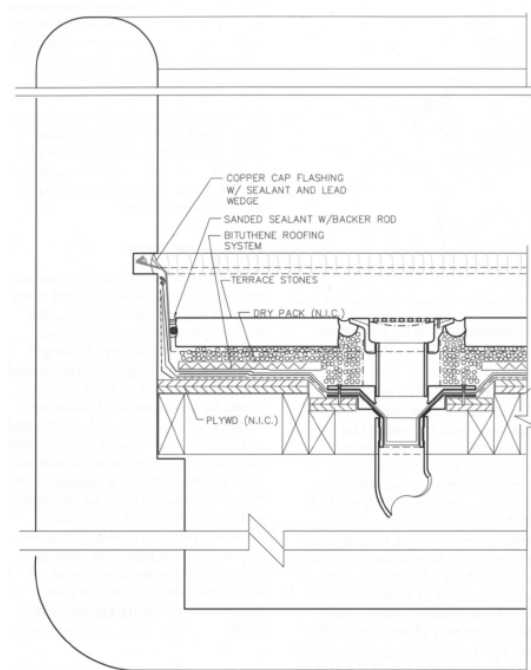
Installation of flashing for water tightness and drains to protect the accessible terraces from water seepage.
